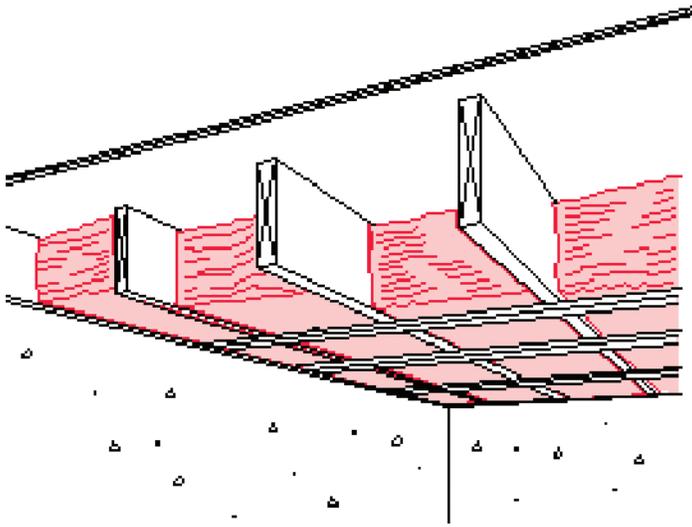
Insulation Cavity Fill [4]. Lath provides a sturdy support for insulation.
